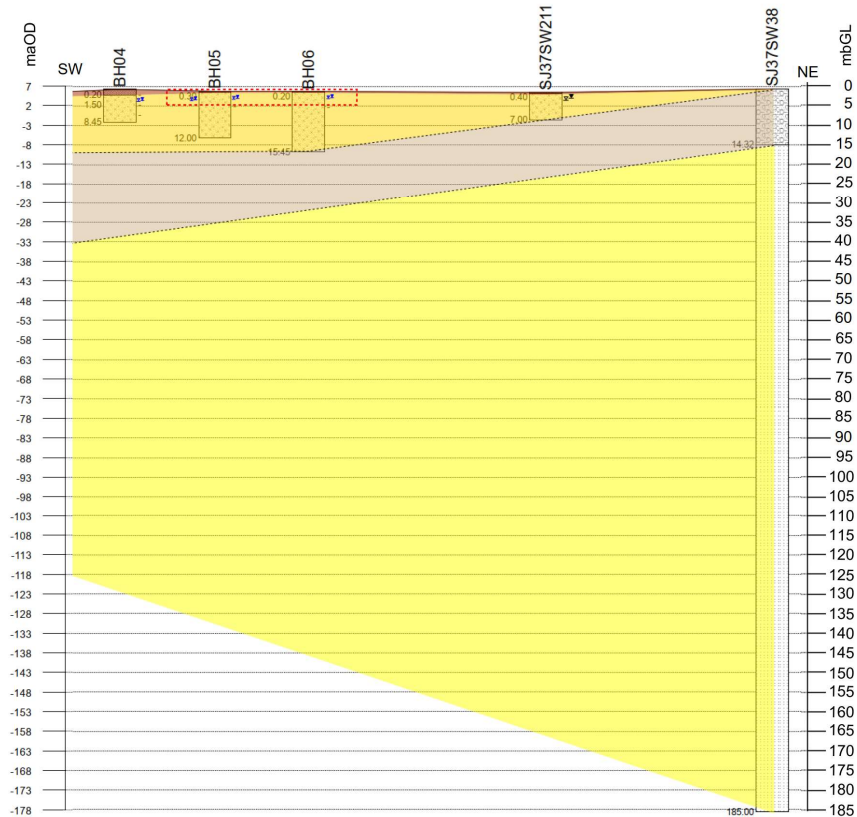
Schematic conceptual hydrogeological section (SW to NE) of trench excavation
